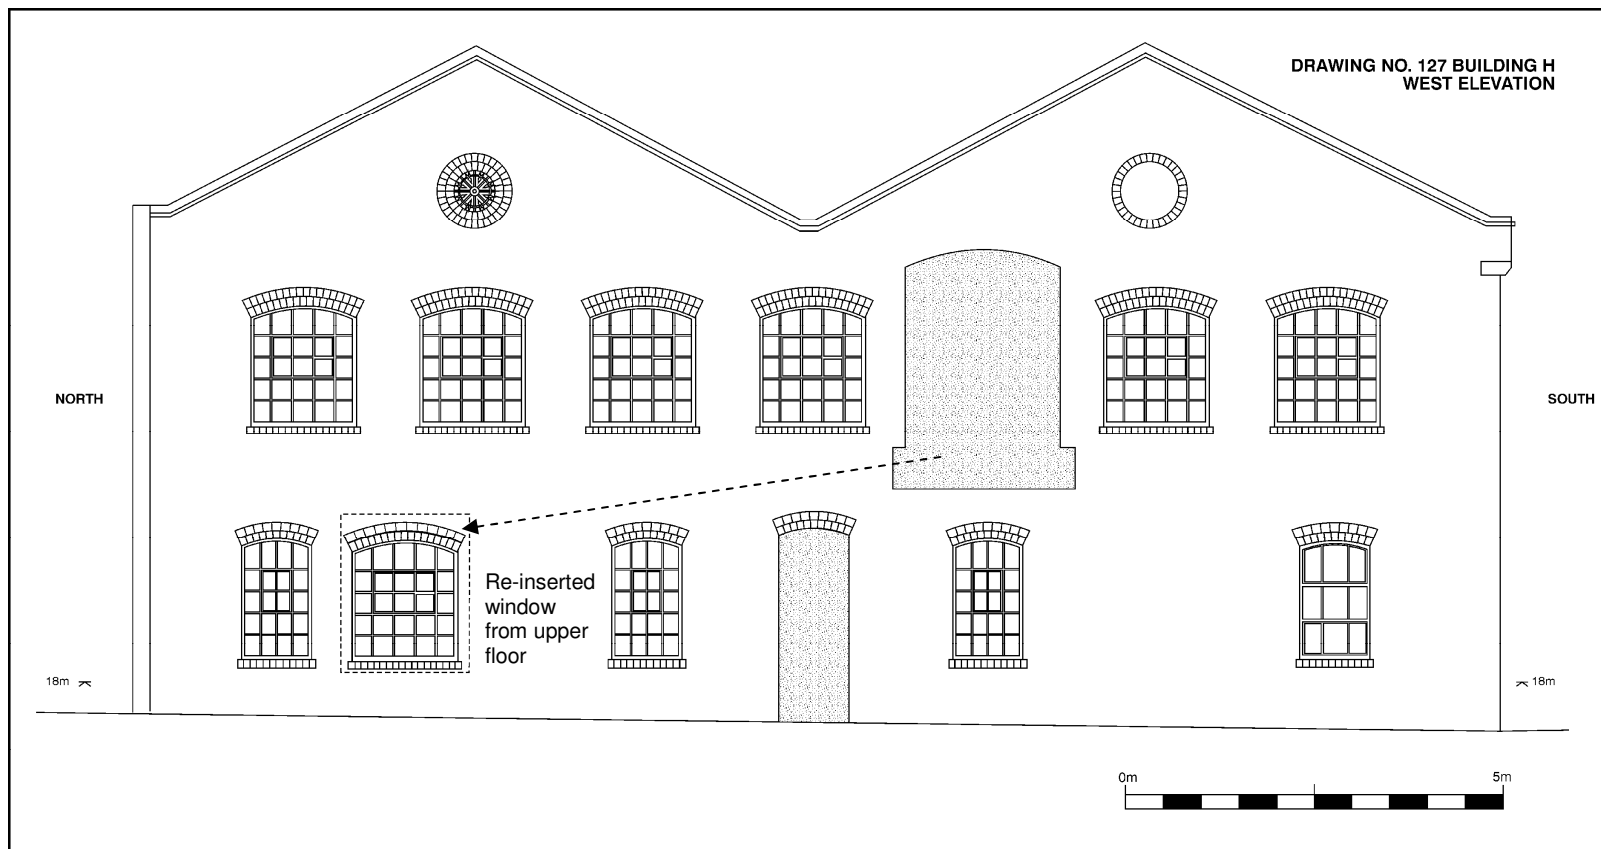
Survey drawing of the west elevation of Building H (scale 1:100)
